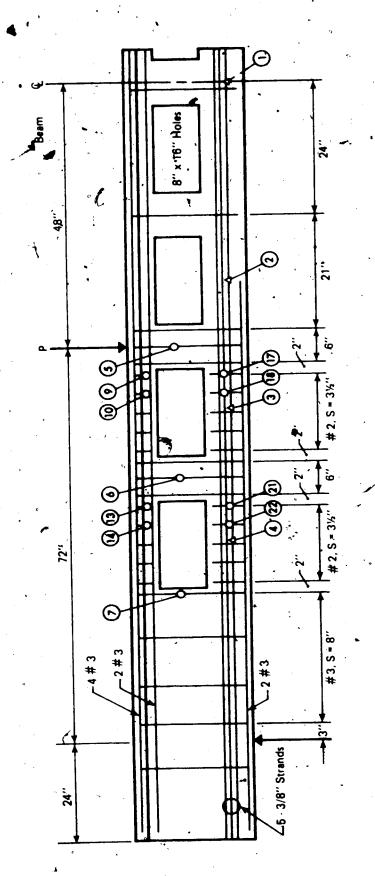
Reinforcement Details and Strain Gage Locations for Beam 3-16-6
